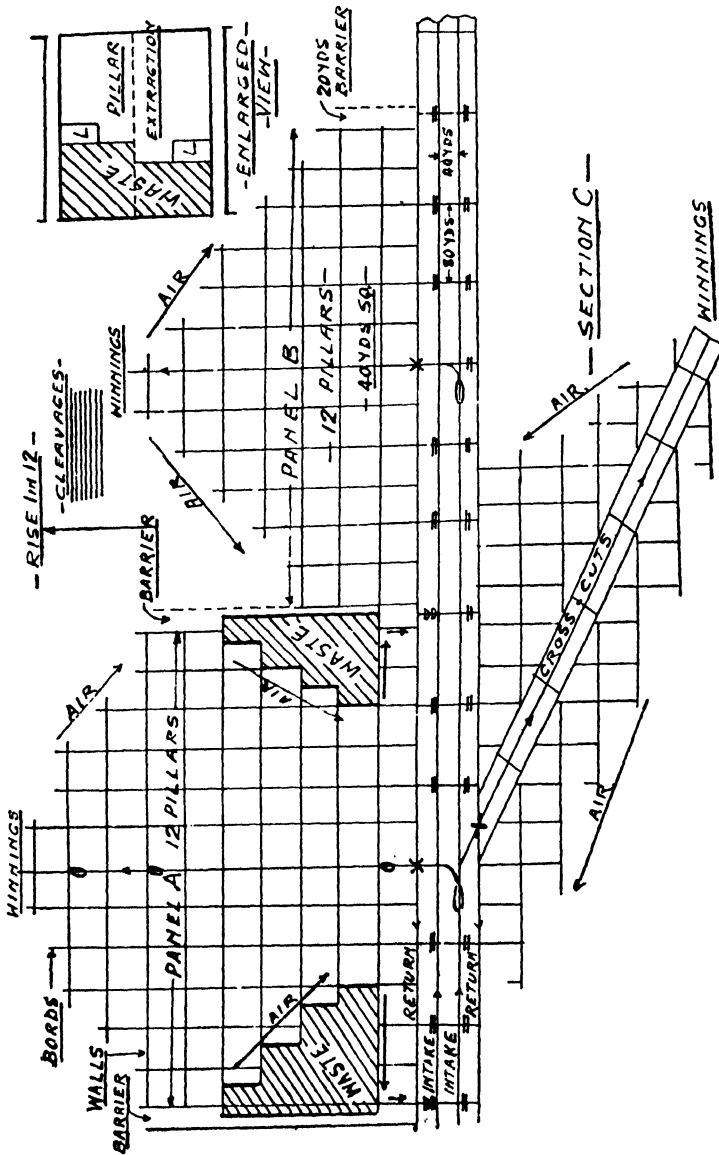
Plan of Layout of Pillar-and-Stall Workings.
